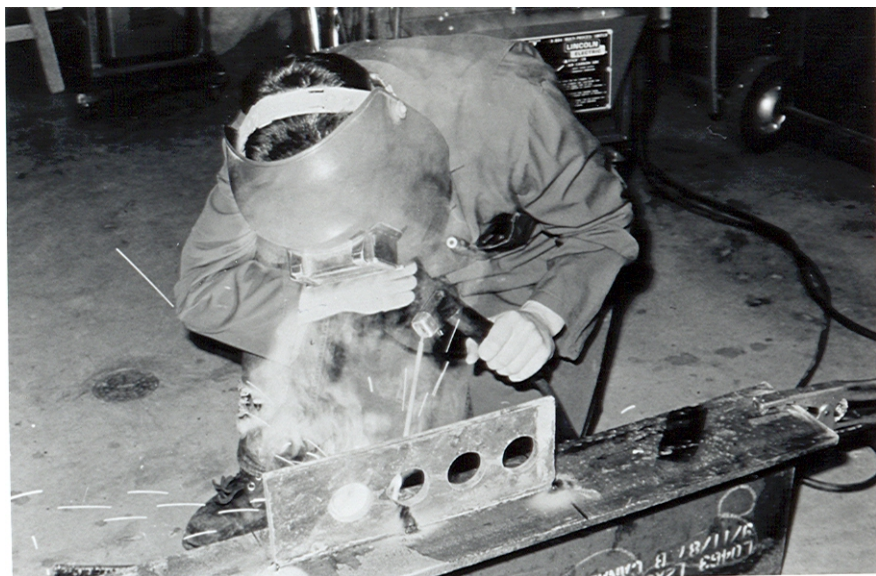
PerFOBOND rib connector welded to beam flange.
